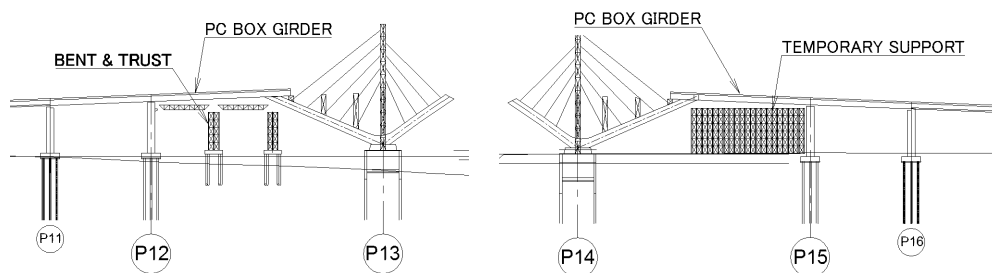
Construction using Temporary Supports (Pale or Bent & Truss System)
